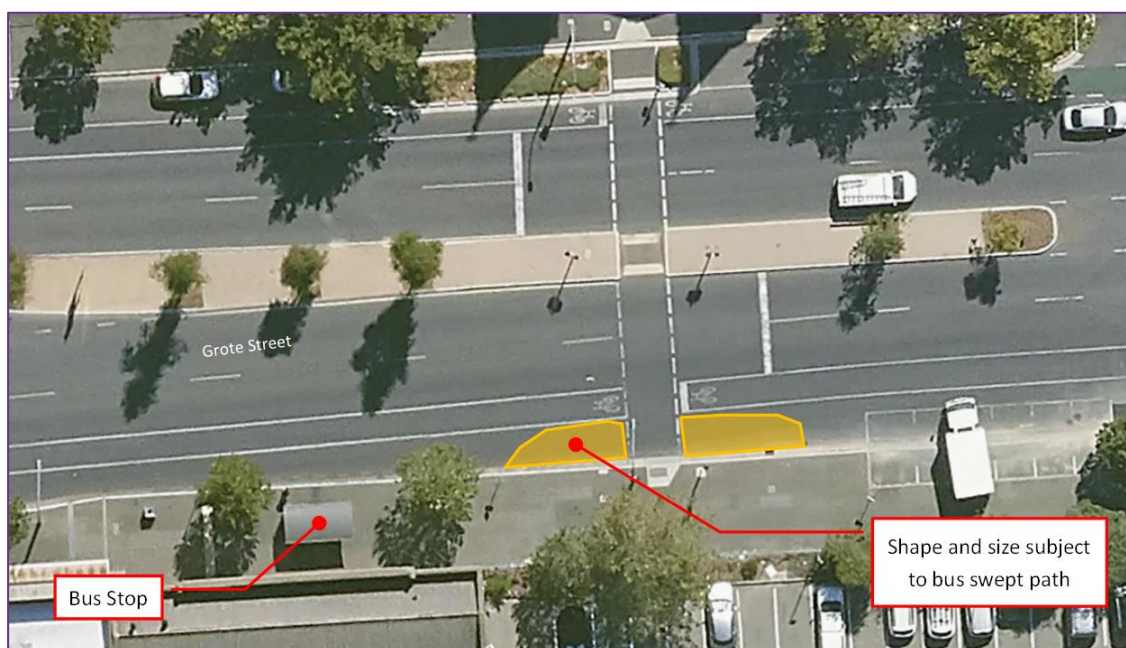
Kerb Built-Out or Extension at the Signalised Crossing
